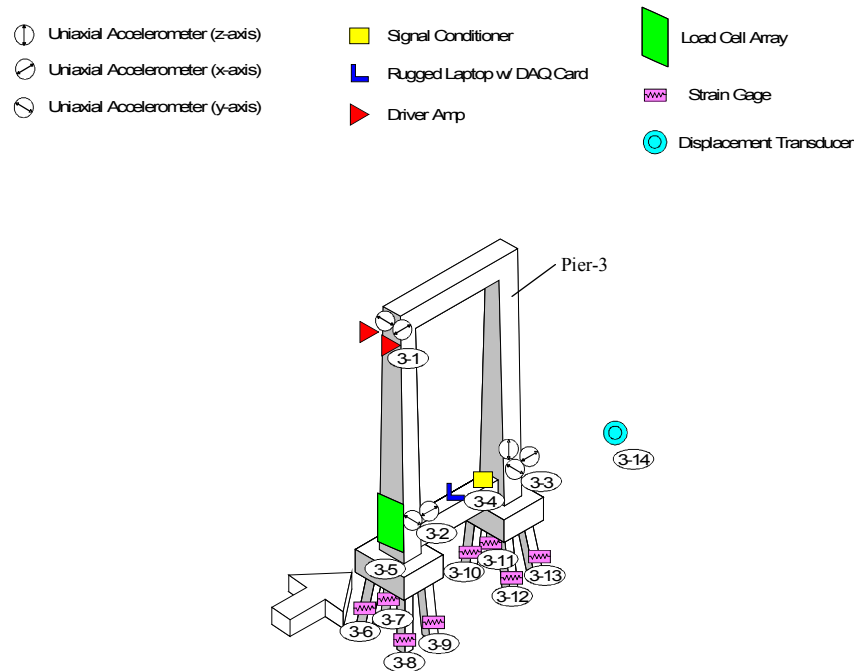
Pier-3 without Superstructure Instrumentation Setup
